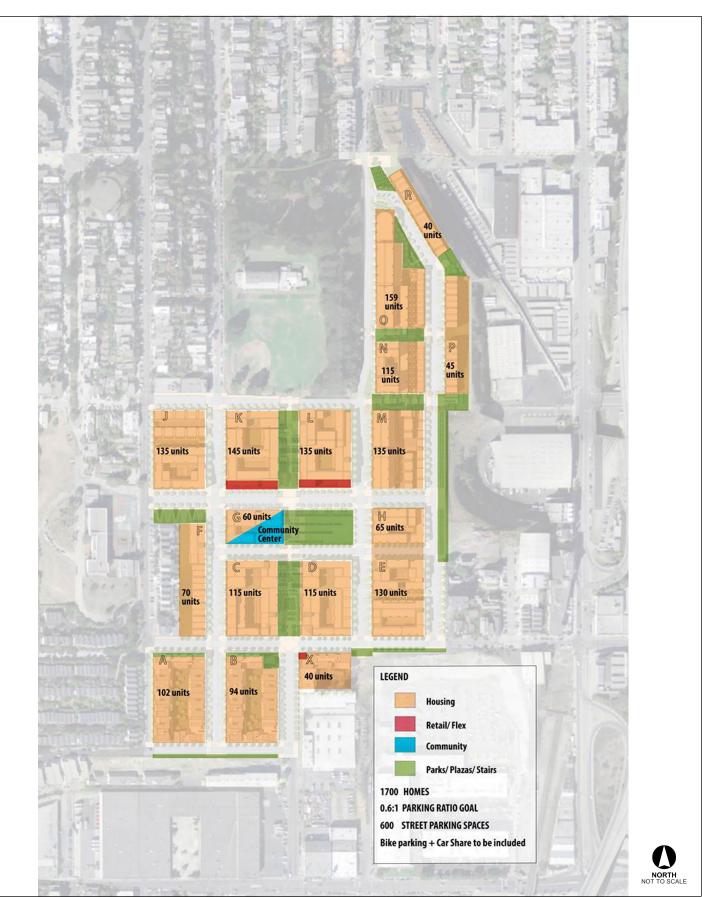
, *Proposed Project Land Use Plan*, depicts the types of buildings and number of units that are proposed. Residential buildings would consist of townhomes, townhomes over flats, and stacked flats. Townhomes would range from two to three stories and would be attached to horizontally or vertically adjoining units with a common exterior wall. Townhomes would be two to four bedrooms. Flats are, by definition, single-story units. Flats would generally be stacked vertically with other flats or townhomes. Flats would be one to four bedrooms.
